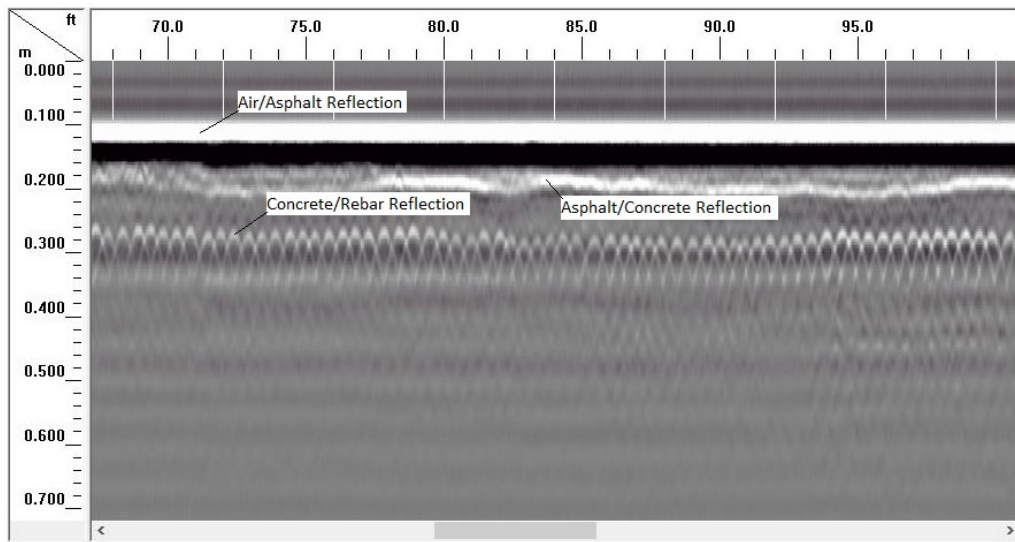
Typical GPR profile for a concrete bridge with asphalt overlay
